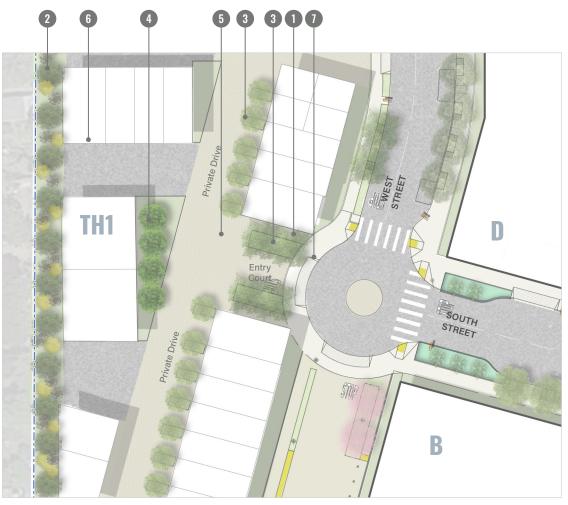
Townhouse Entry Court, Site Plan TH.1
